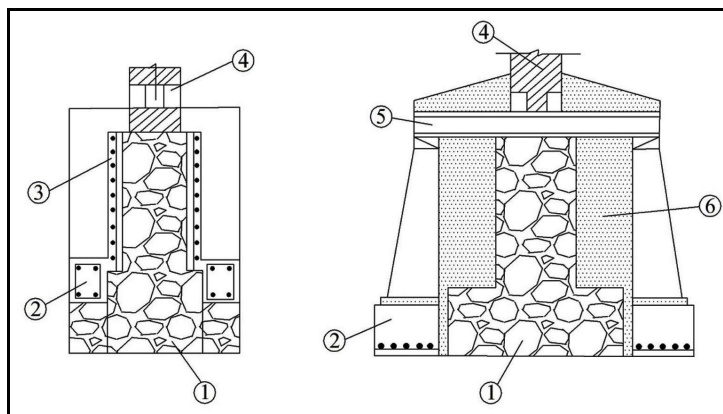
Method of strengthening of the strip foundation; 1- foundation; 2- concrete beam; 3- jacket; 4- wall of building; 5- steel crossbeam; 6- monolithic concrete [1]
